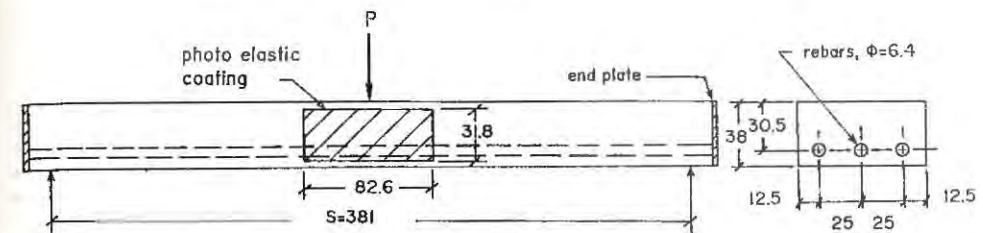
Model beam with end-anchored reinforcement (after ref. 18).
